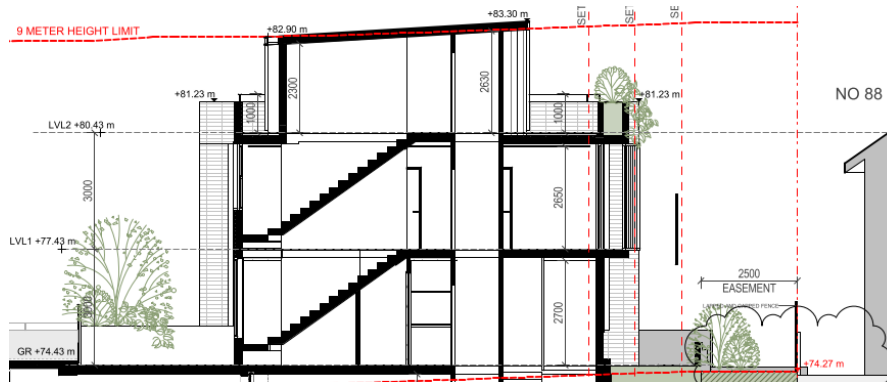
Section through TH 4 and Dwelling at 88 Eastern Valley Way
